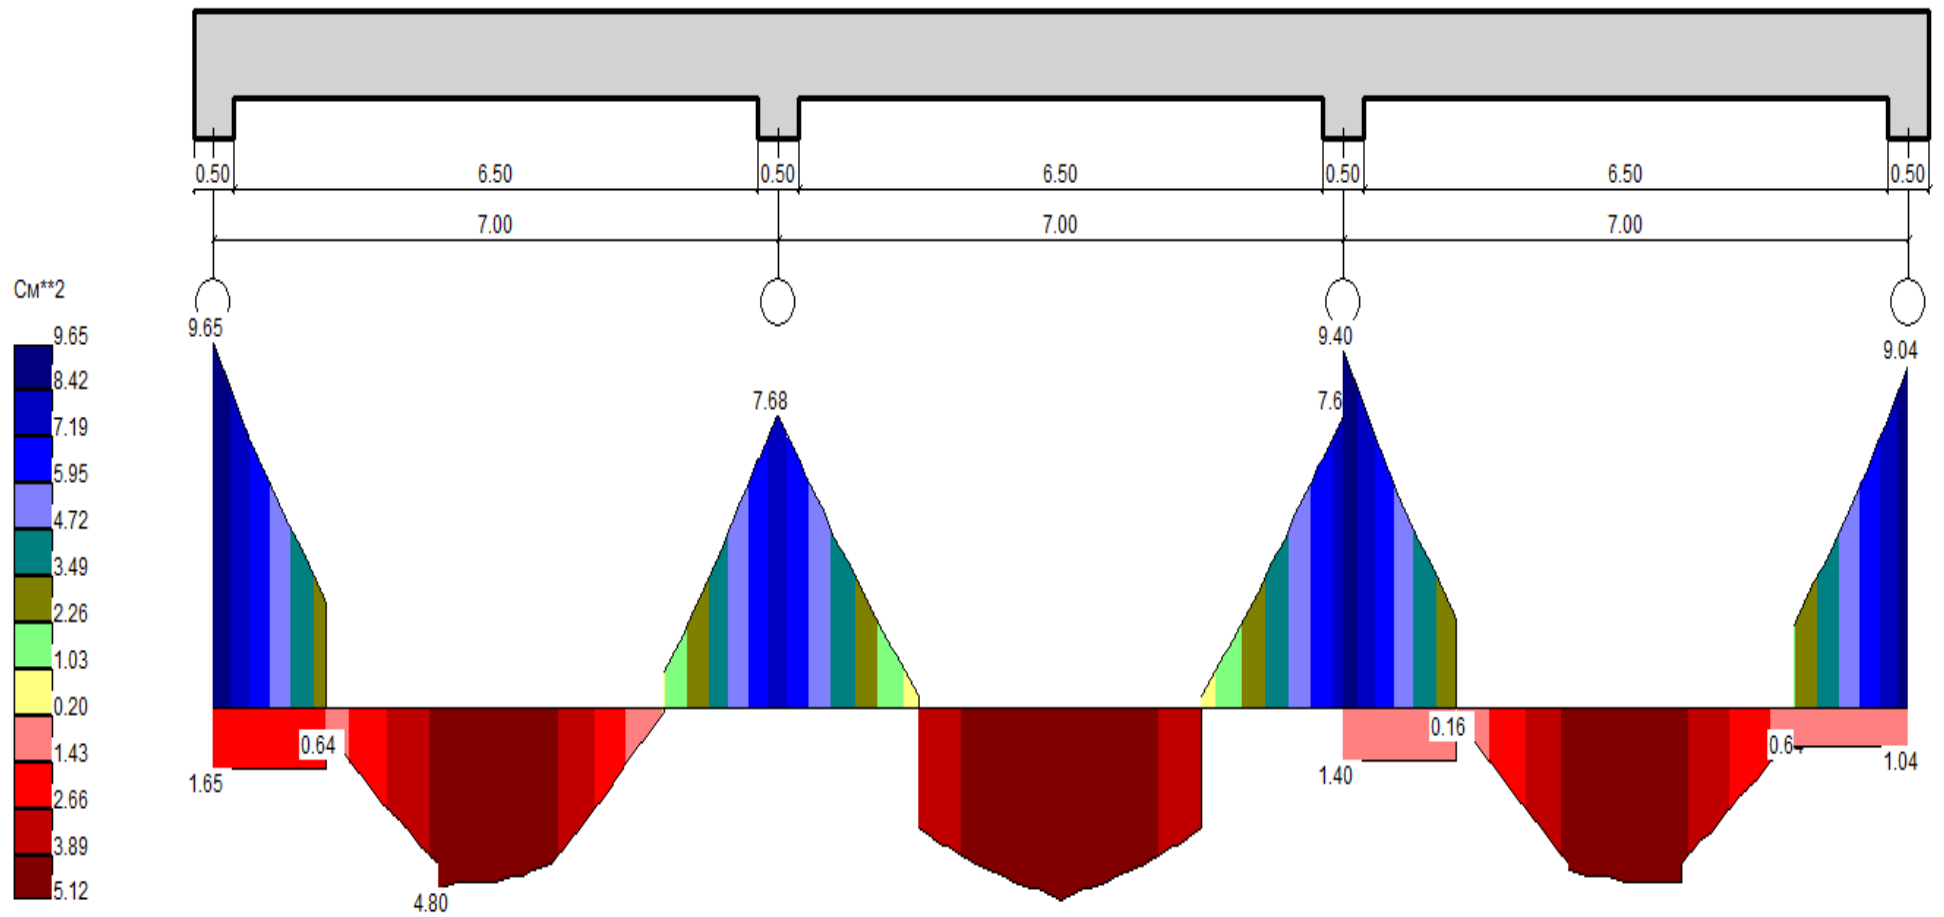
Variant of a building with a beam - slab floor. Beam B2-3. Theoretical diagram of long reinforcement
